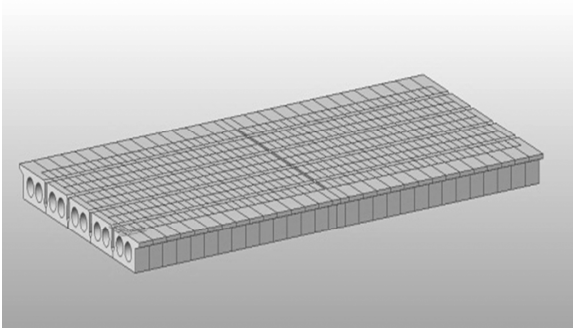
Finite model of the prestressed hollow plate girder bridge.
